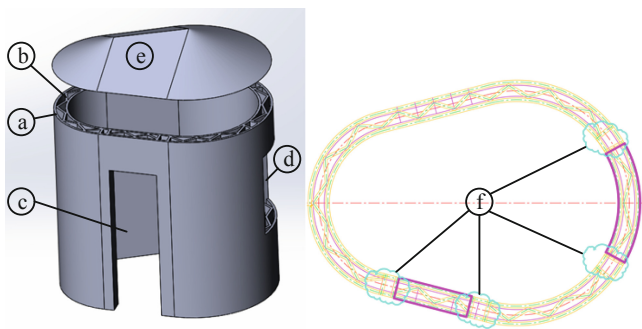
CAD model of the pavilion. (a) Wall contour; (b) Stiffener; (c) Door; (d) Window; (e) Roof; (f) Reserved columns for inserting stiffener and pouring concrete.
